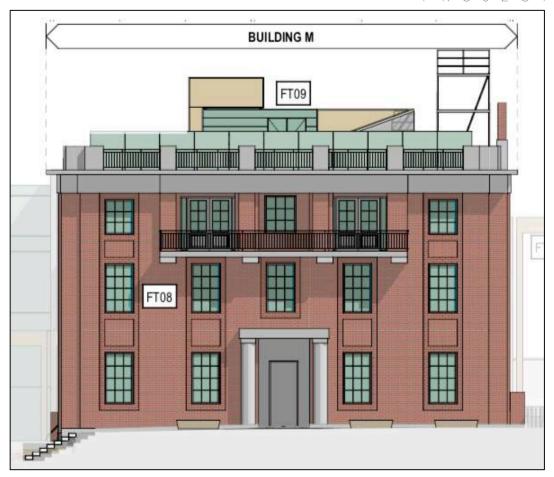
Proposed North Elevations - Building M, (Source: FJMT 2020 SSDA Design Report: 65)
